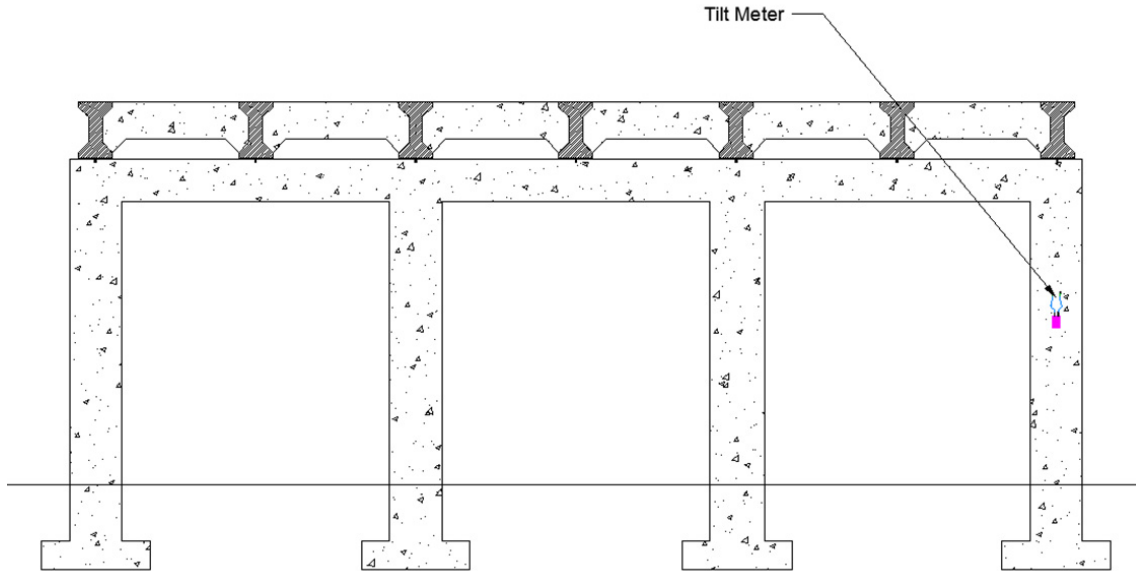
Bridge 2 - FBG Tiltmeter Layout – Pier Columns
